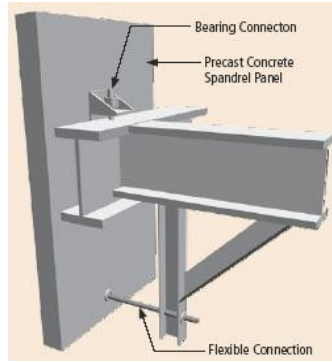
Cladding connections (from Precast/Prestressed 2007, by permission)
